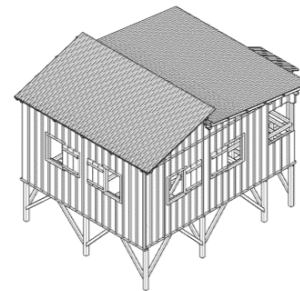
Example of a recurrent type of wooden house, R. Boa Entrada [ASF].
